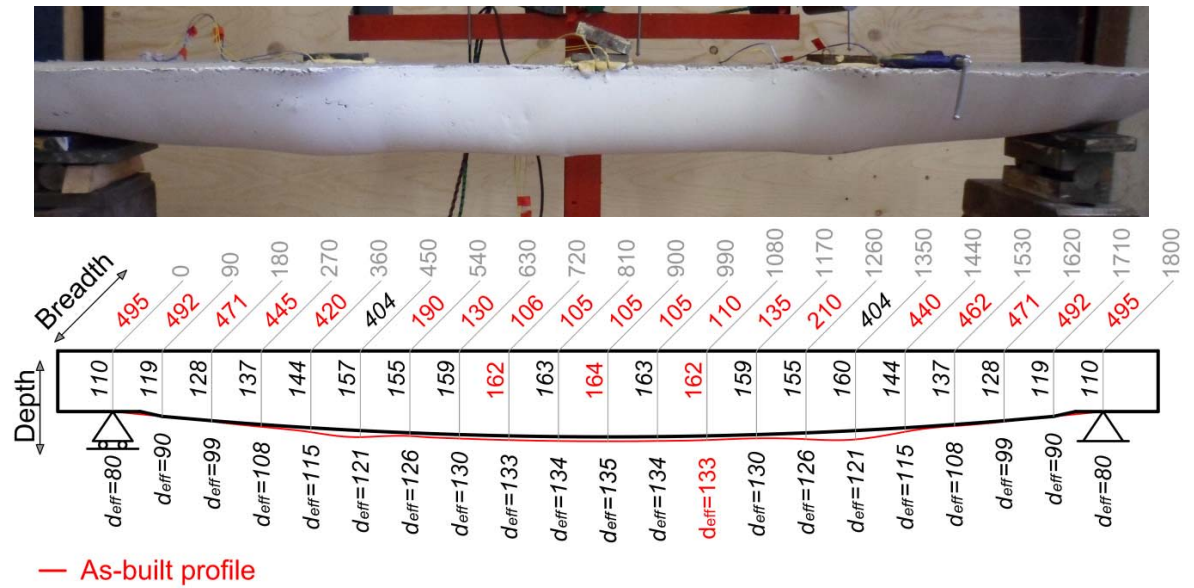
FFB 11 as-built measurements (all dimensions are in millimetres)
